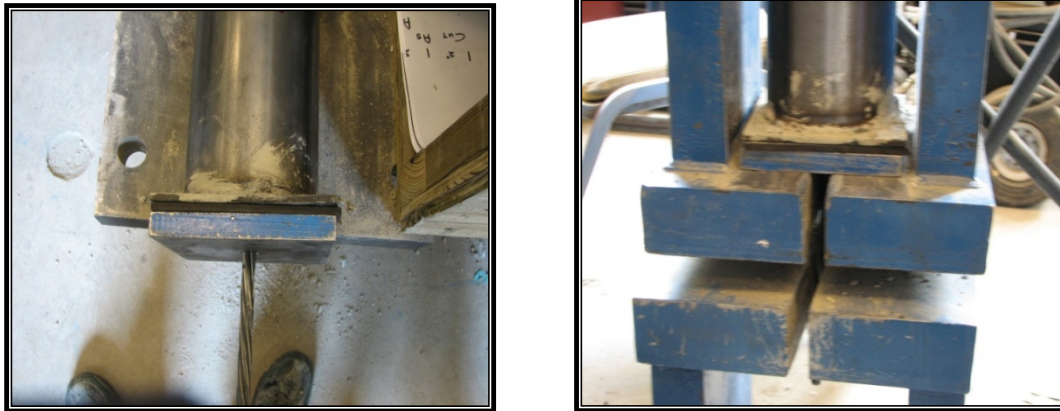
Position of Neoprene Pad, Base Plate Specimen is mounted on the Test Frame
